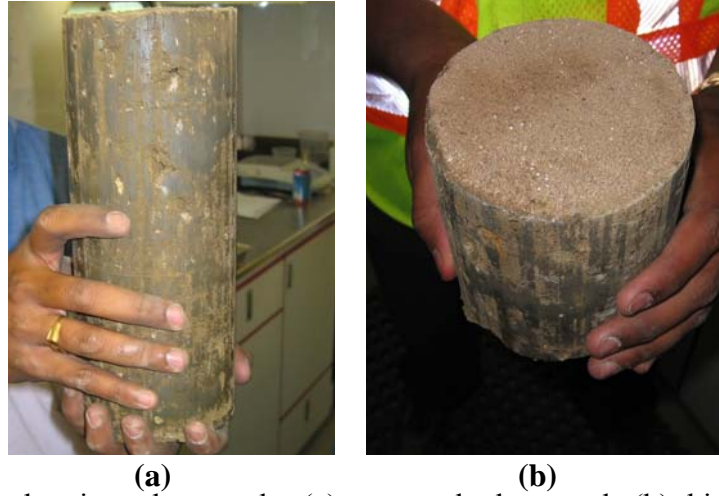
Figure showing tube samples (a) extracted tube sample (b) thin layer of sand at the sample surface
